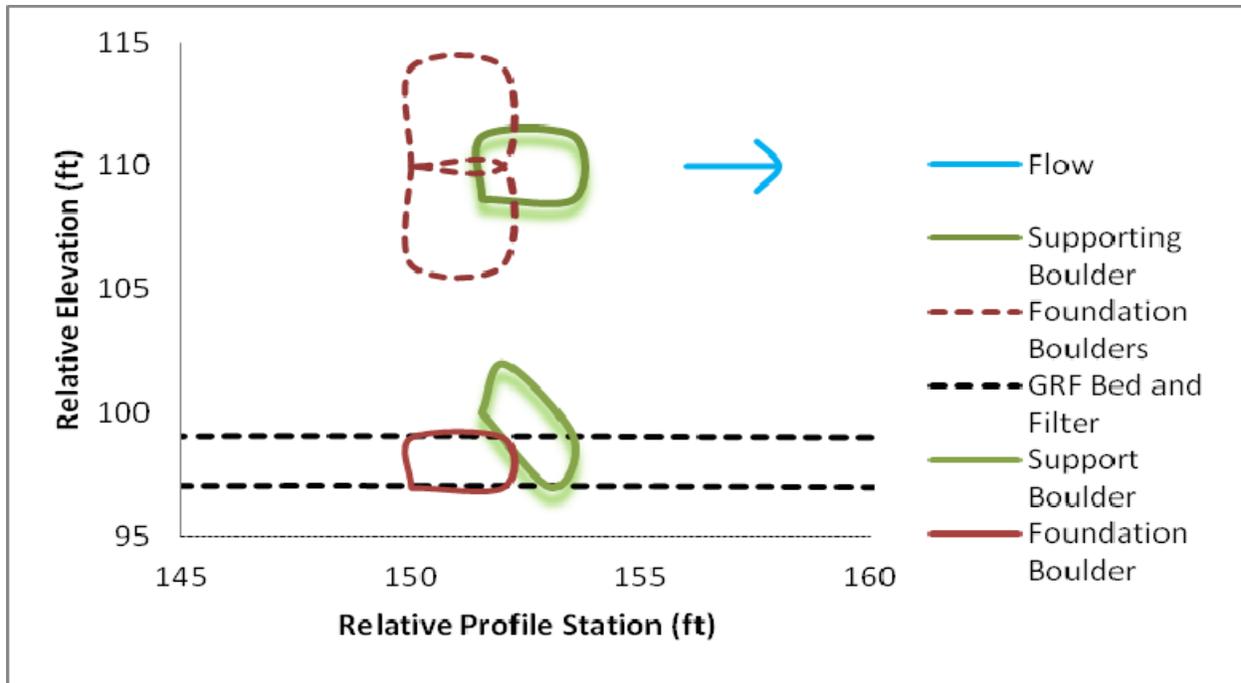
Second step in the construction of a boulder cluster: support boulder.
